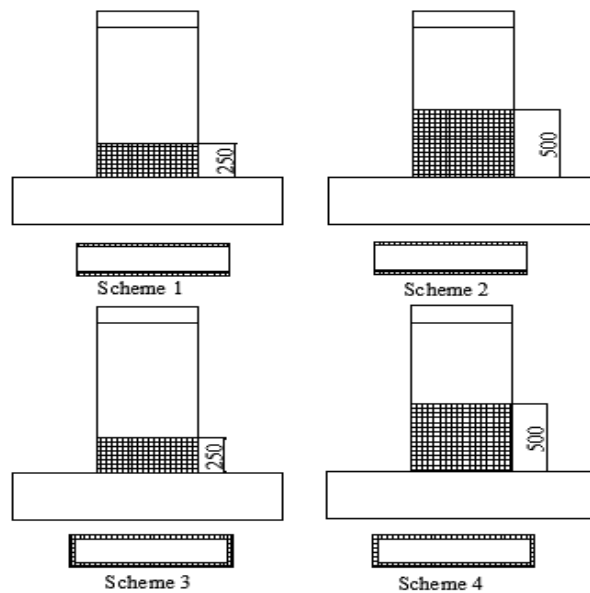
Scheme Types for strengthening Rec. - Shear Wall
